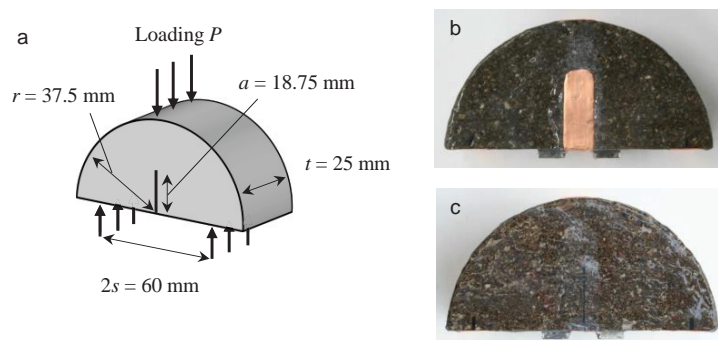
SCB specimen; (a) the geometrical dimensions of the specimen and loading configuration, and (b) and (c) the picture of Specimen (O) and Specimen (I) (defined in Section 3.1), respectively.
